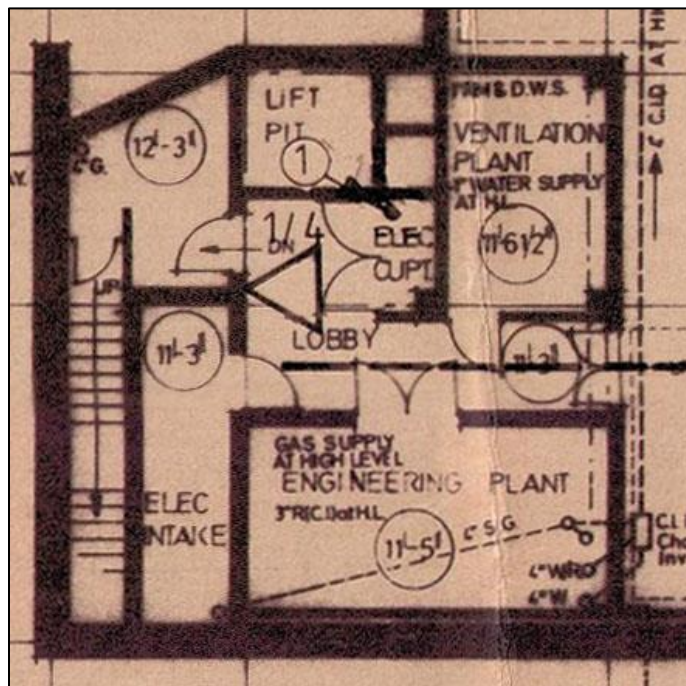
A 1984 floor plan of the basement to the eight-storey office block (Chief Engineer's Office, Metropolitan Police)
